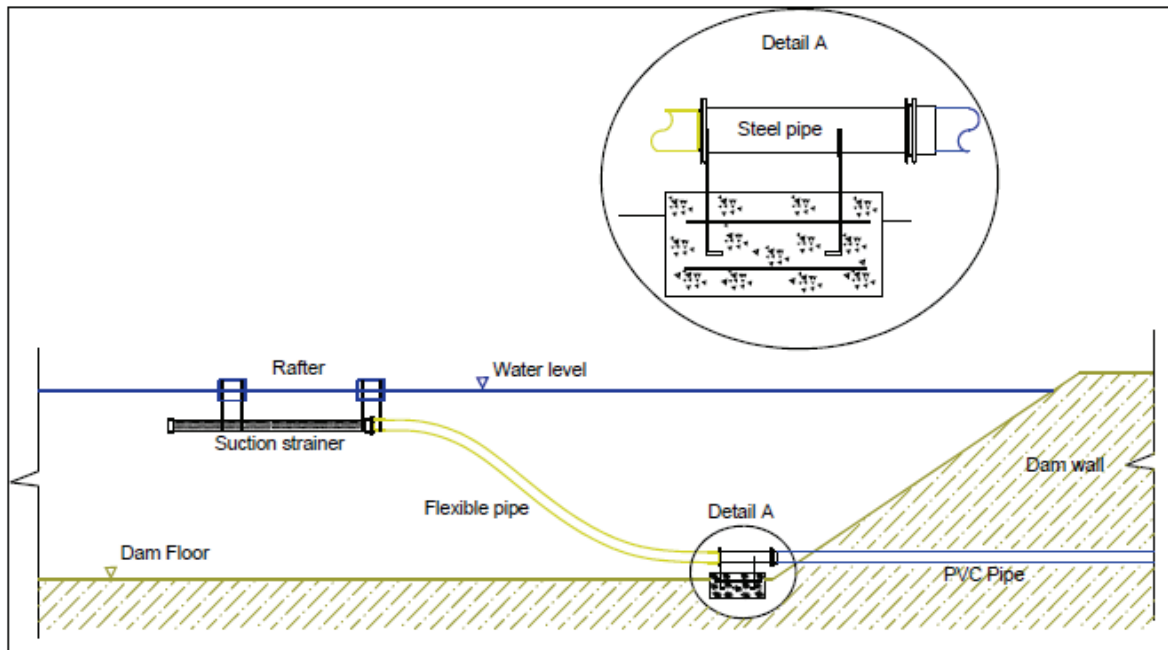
Mounting the suction pipe on a float (Netafim, 2008)
